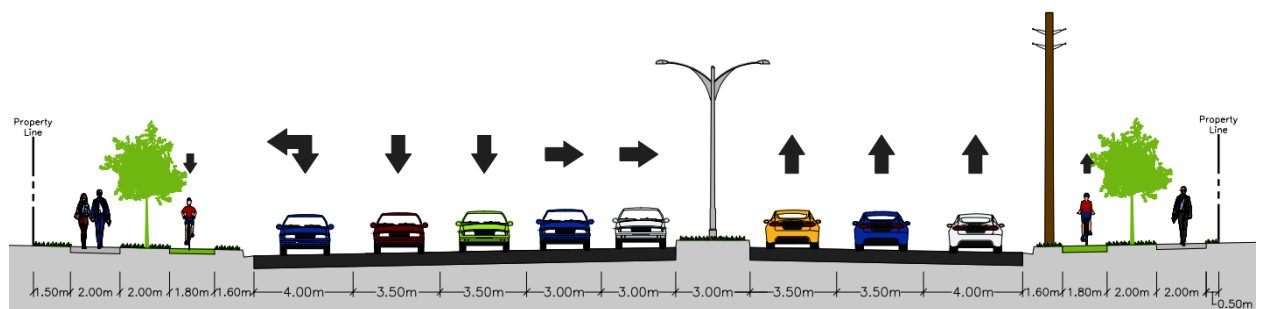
Preferred Fanshawe Park Road Cross-Section, East of Richmond Street
